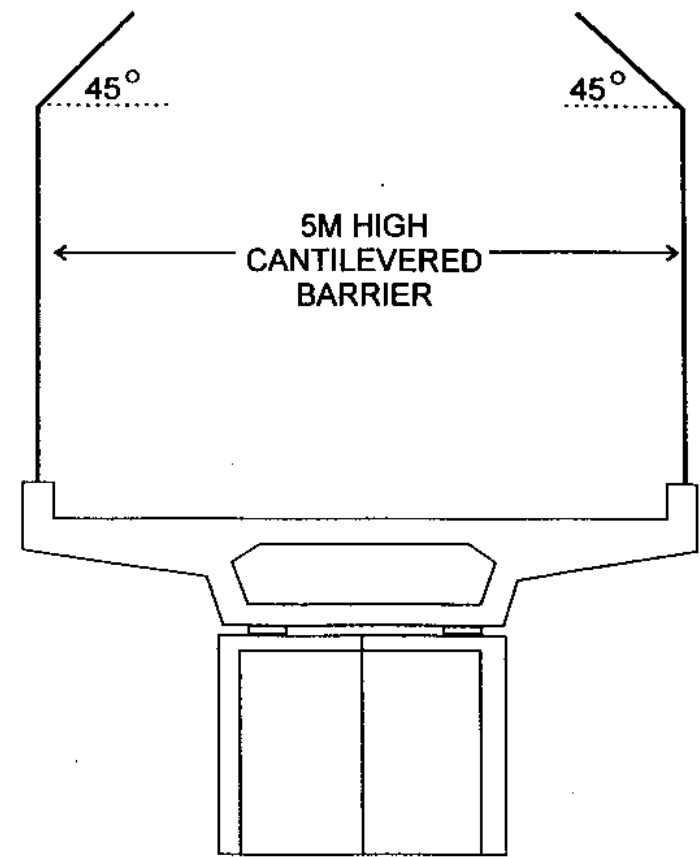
GENERIC DIRECT TECHNICAL REMEDIES FOR ROAD TRAFFIC NOISE ON FLYOVERS - VERTICAL BARRIERS
